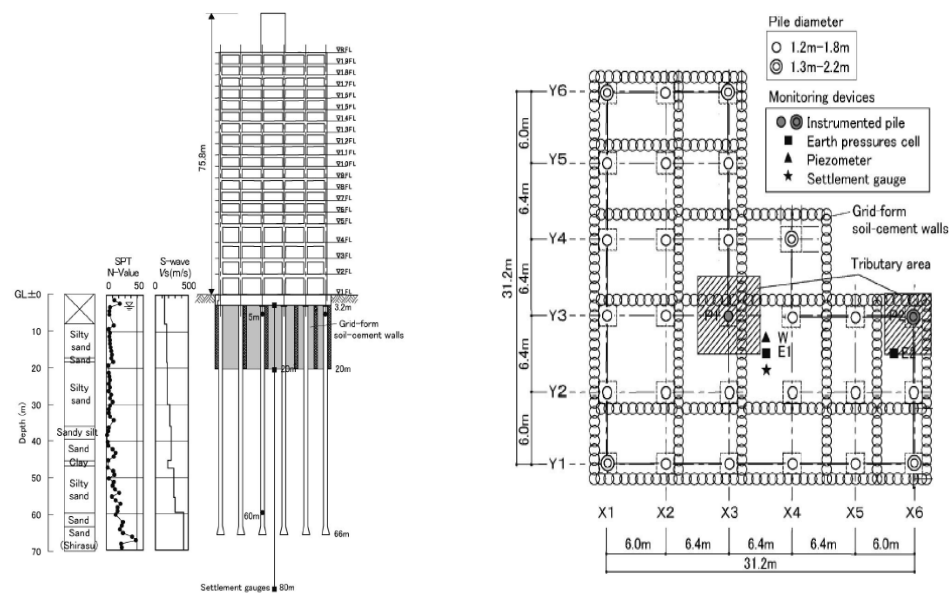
Soil profile, foundation plan and elevation of nineteen story residential tower, adapted from Yamashita et al. (2011)
